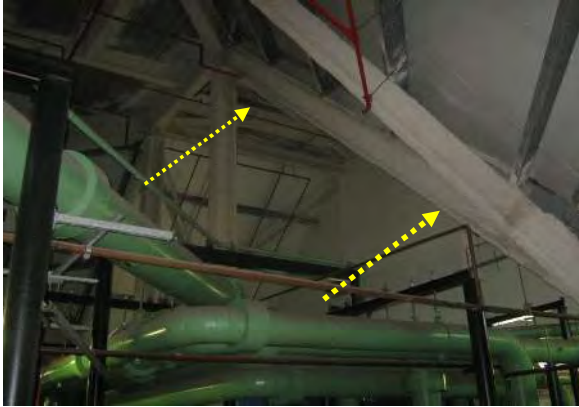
Level 32 Plant room; Chiller pipe network – Flow and return pipe connections; Vulcanised gaskets to flange pipe junctions and shut-off valves.
